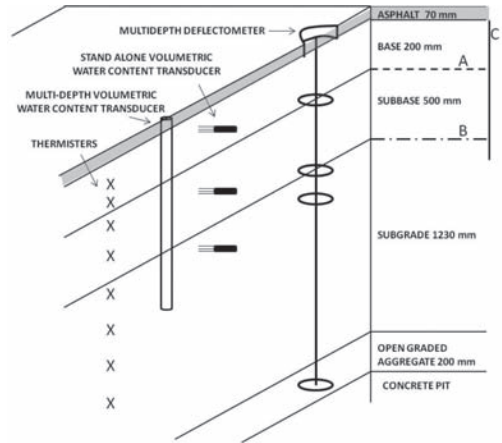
Schematic illustration of the field test sections and of the instrumentation layout.
